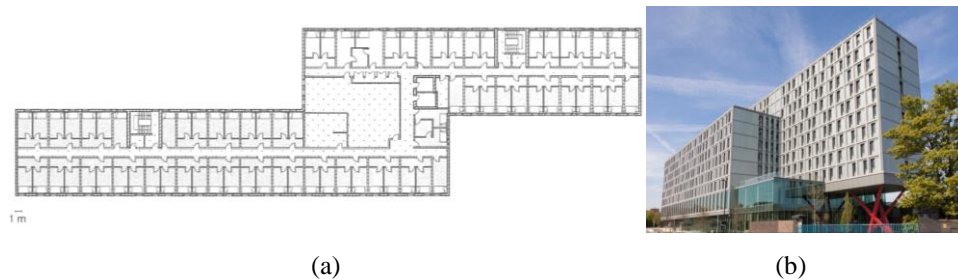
(a) Old Oaks typical floor plan and (b) Old Oaks sliding tracts
